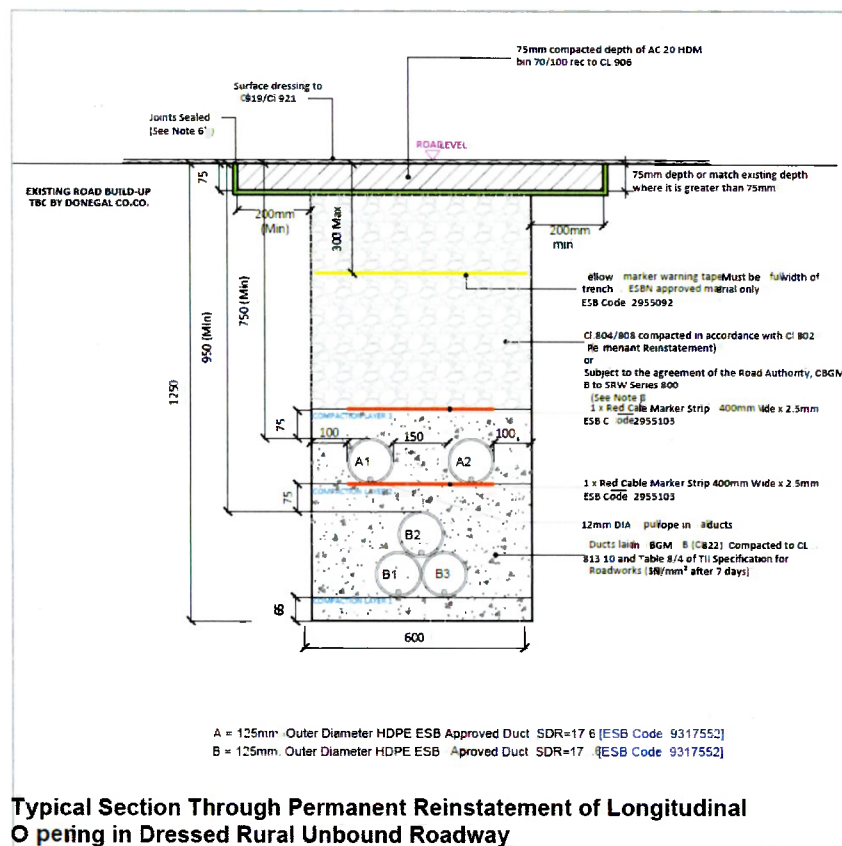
Typical 110kV Trefoil Trench in Rural Roadway
